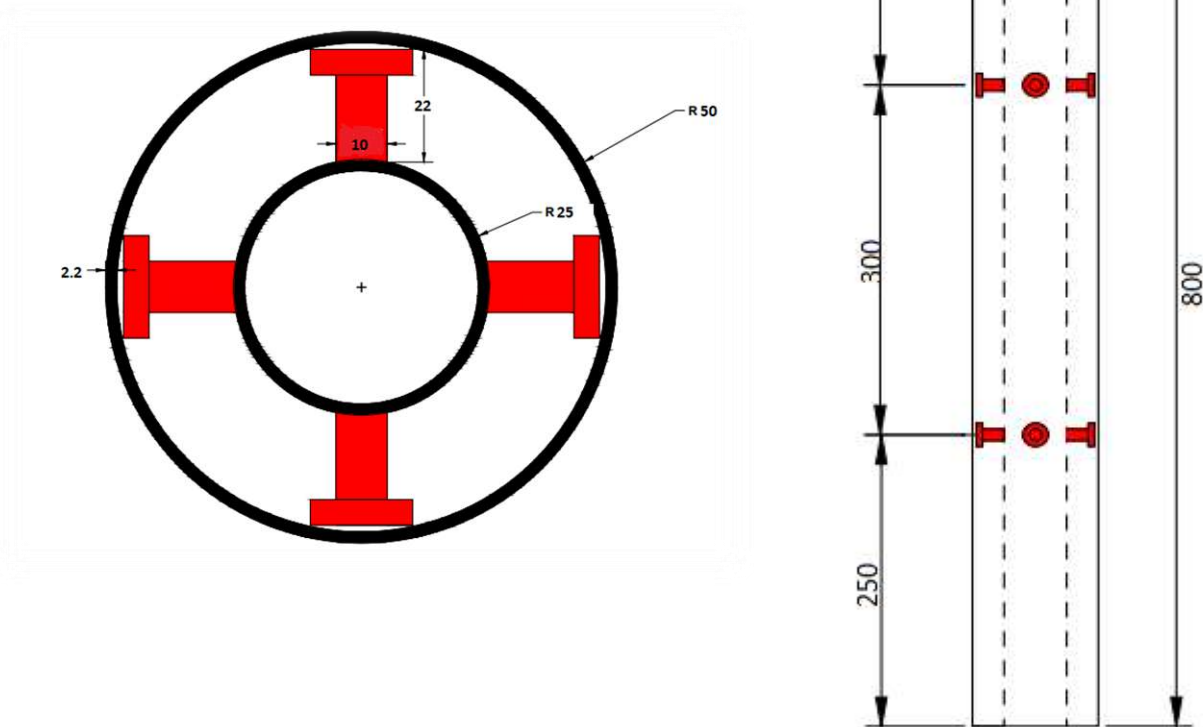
welded bolts for inner tube of column(all dimension in milimeter)
